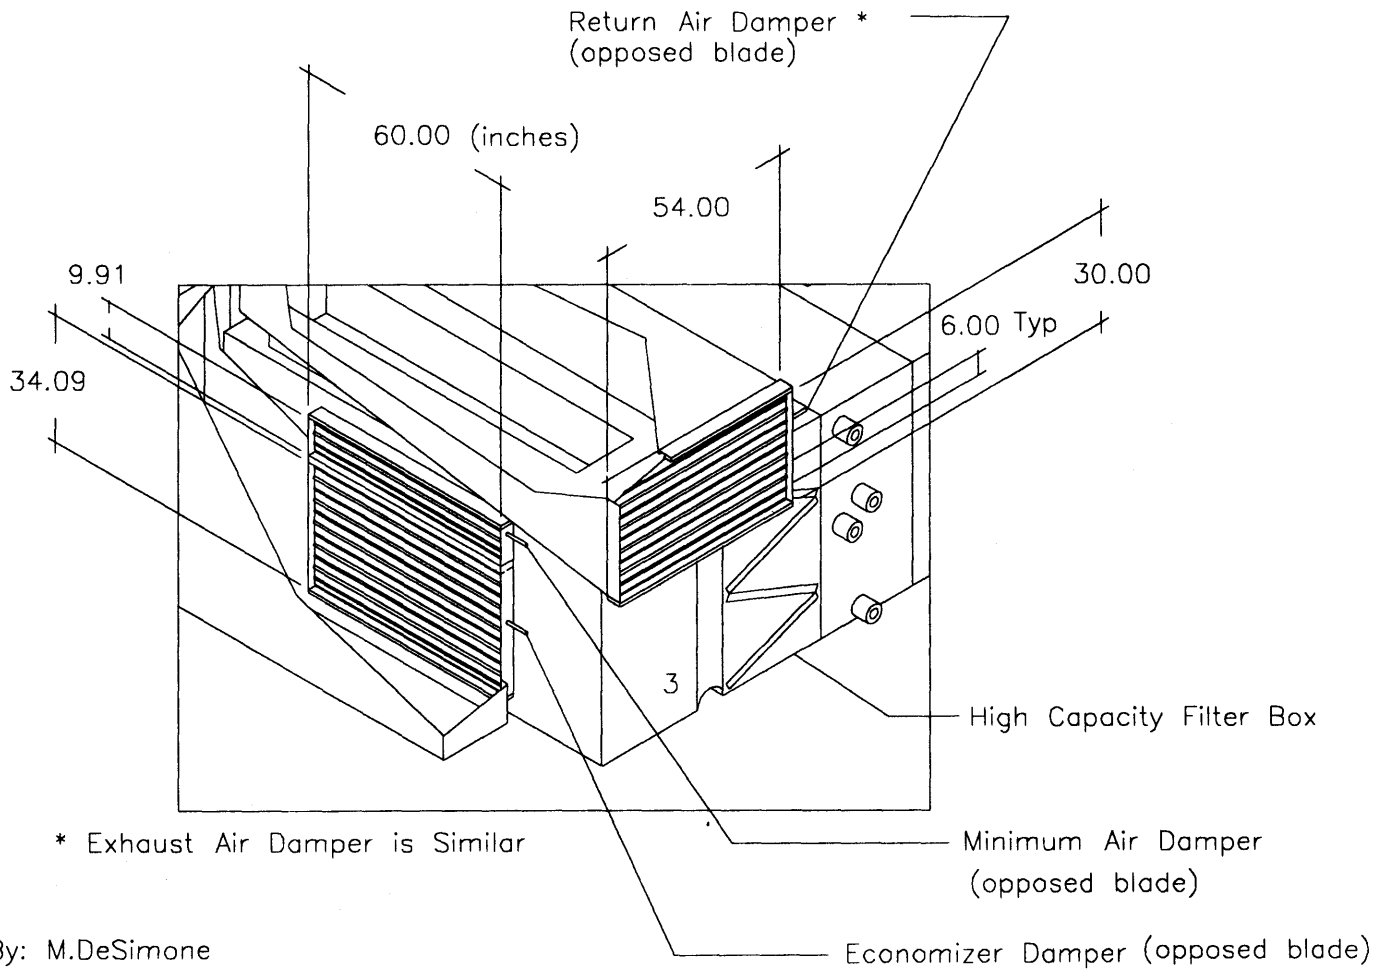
Building E51 Supply Air Conditioning Equipment (AHU)
